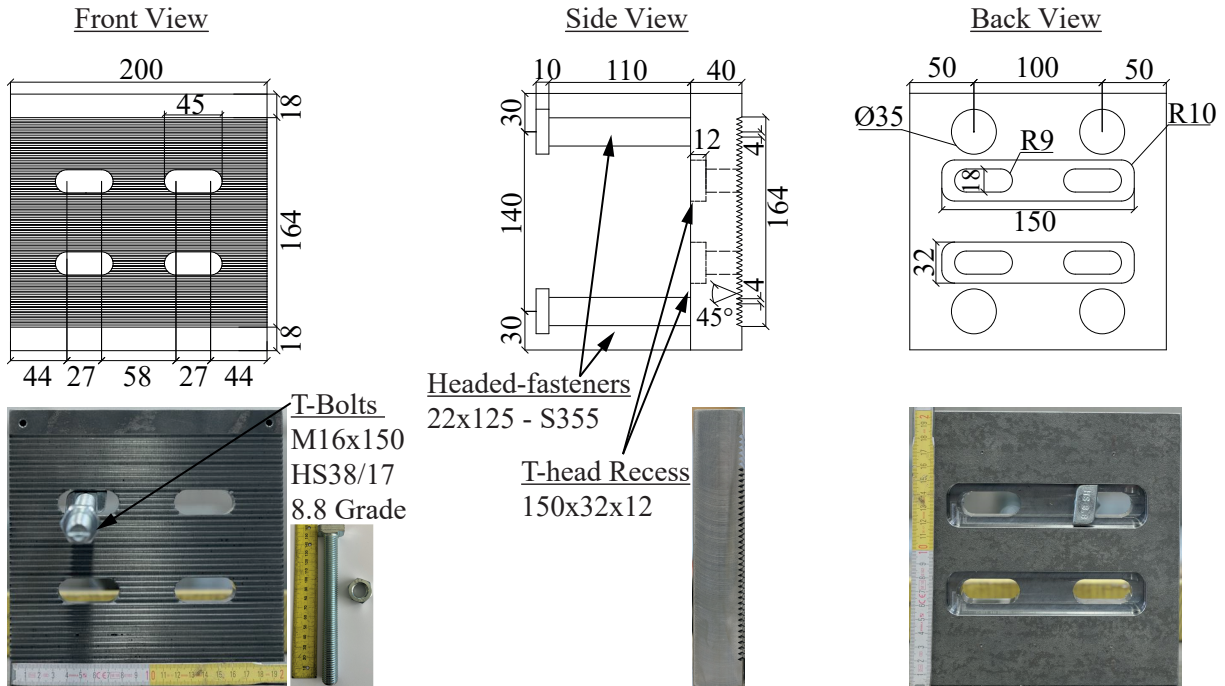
Overall configuration and the technical drawings of the test frame.
